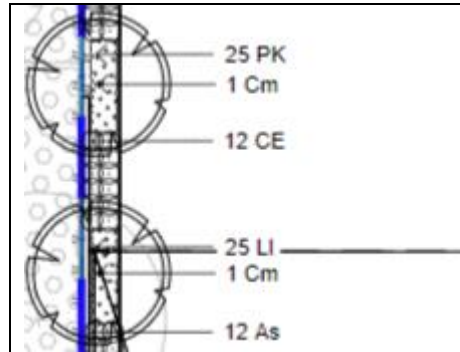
Excerpt from Proposed Landscape Plan showing awning line over trees
